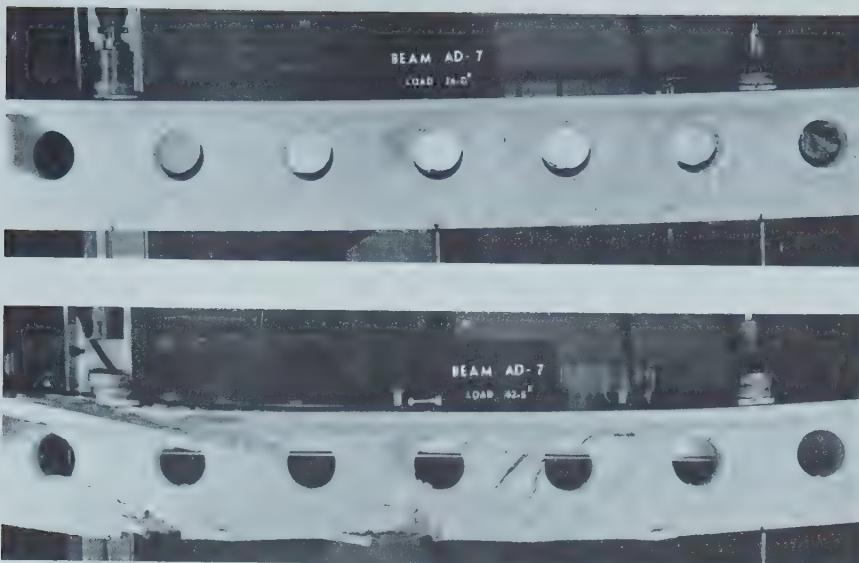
BEAM AD-7 CRACKING AND FAILURE PATTERNS
